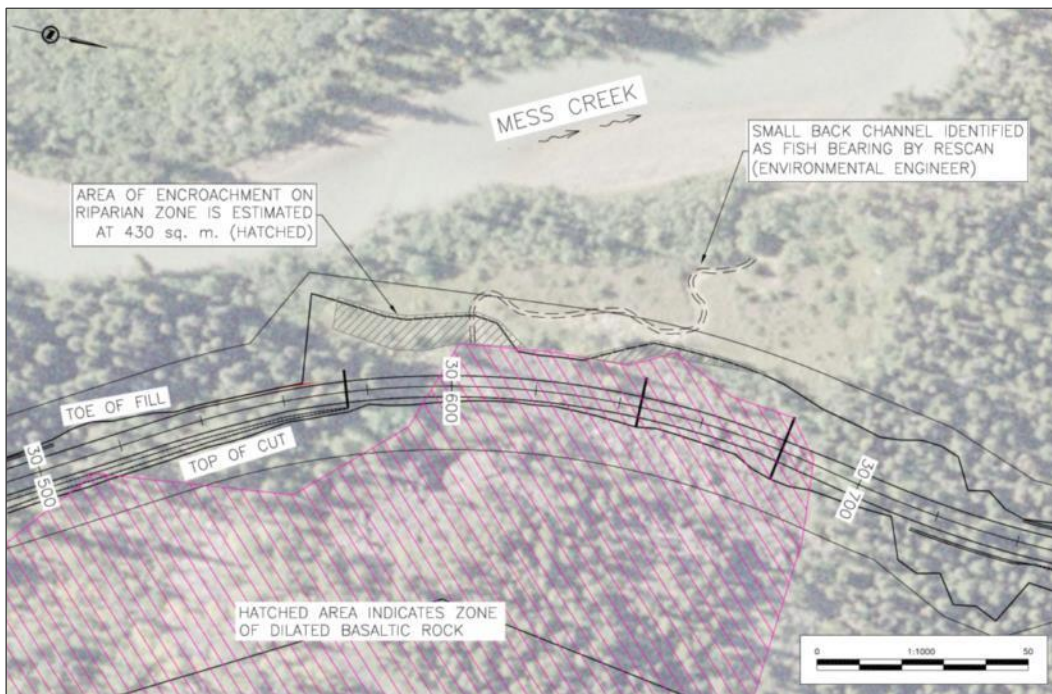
Potential HADD Site – km 30.54 to 30.7
